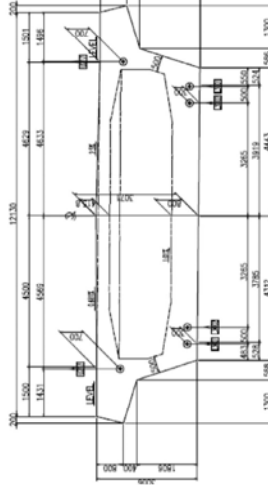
Cross-section of PC-Girder (End of girder, A2)
